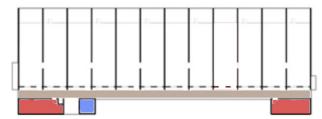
Case 5 Typical Floor Plan Source: adapted from diagram by M. Young QUT
